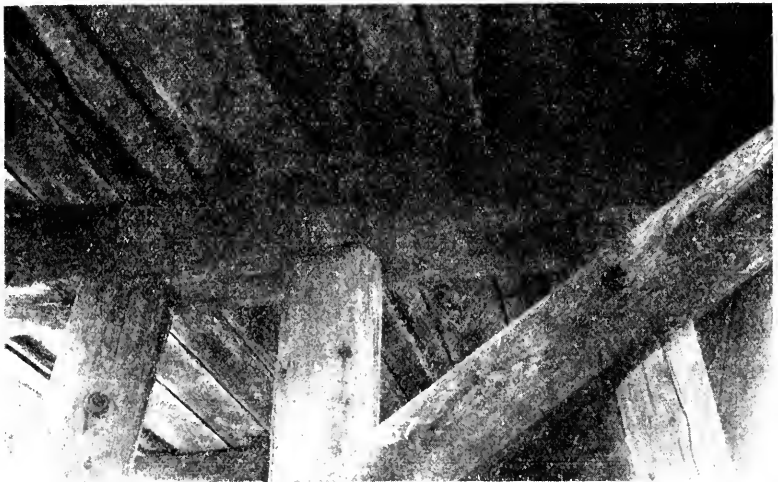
Bridge 485-A, Southern Pacific, at Alhambra Avenue, Los Angeles. Eighteen-foot deck of creosoted Douglas fir constructed 1899, 30 7x16 stringers. Creosoted deck supported by two brick piers. Ballast rests on 3-inch creosoted deck plank and the stringers are laid on 7x12 creosoted wall plates. No repairs have been made to this structure since constructed. All timbers in sound condition. Photographed August 9, 1928.
